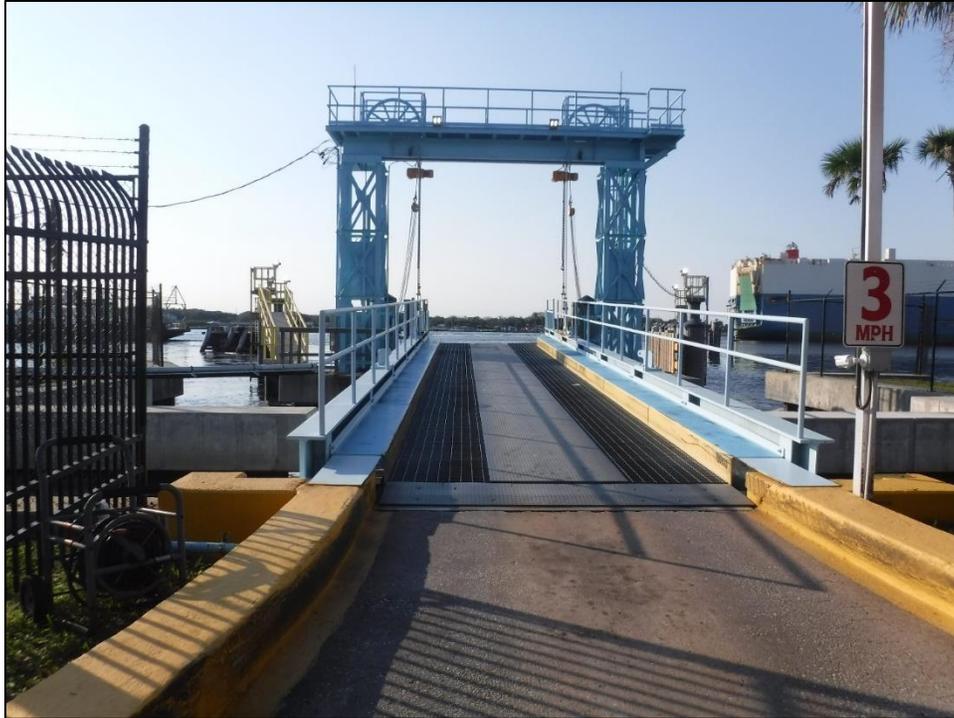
Bridge No. 720933/8DU24183 (Mayport Ferry), facing West
